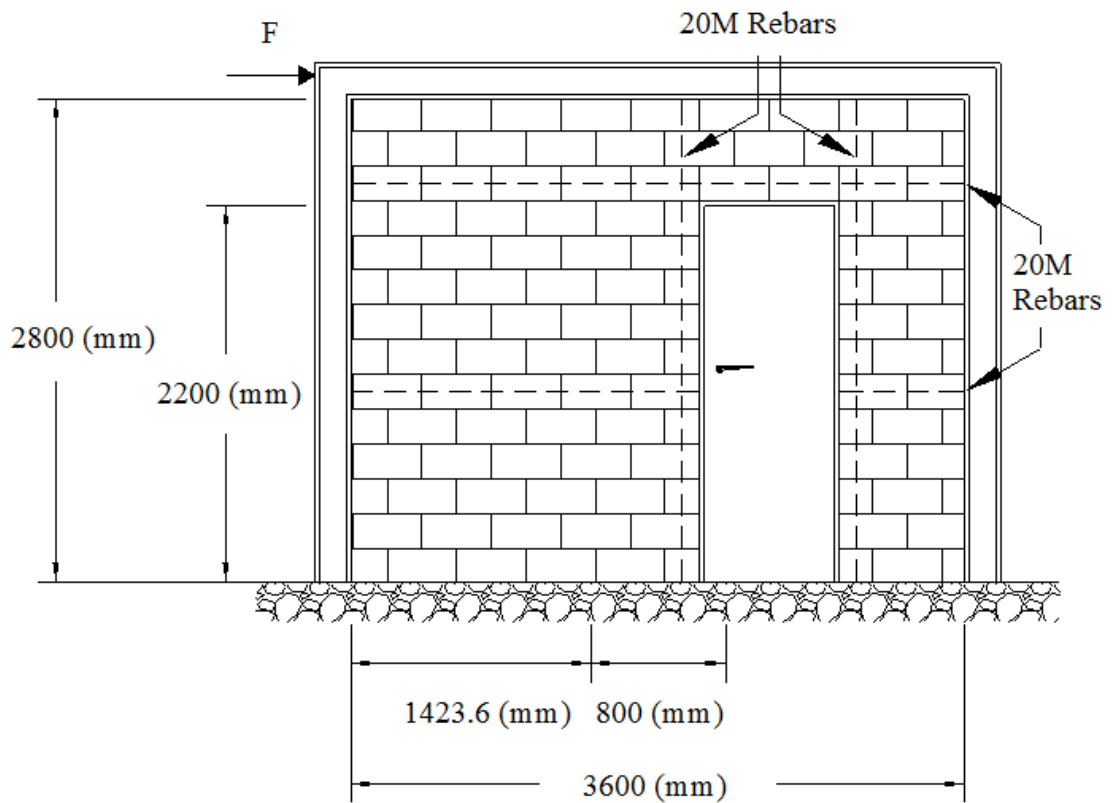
16. Reinforced Infill Wall Case With Opening Offset Away From the Loading Reinforced Infill Walls (NTS)
